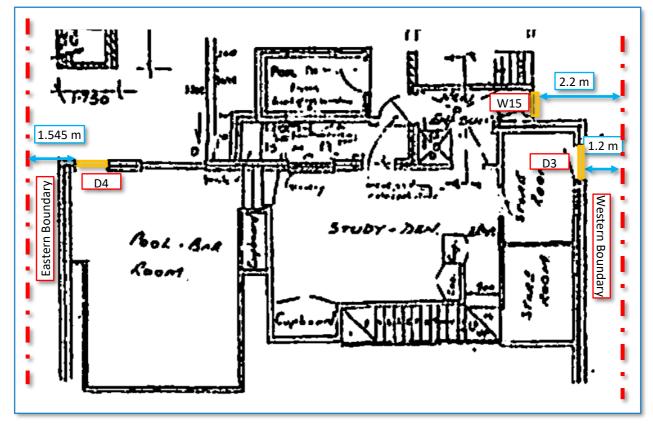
Lower Ground floor plan showing unprotected openings and distance to eastern and western boundary
